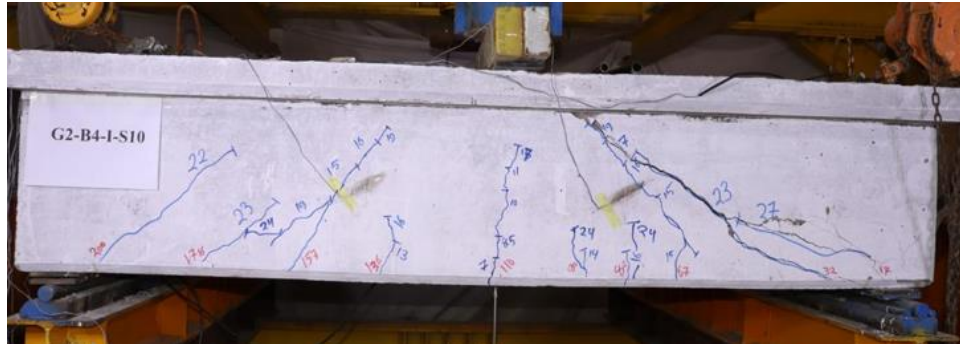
Failure crack pattern of specimen G2-B4-I-S10
